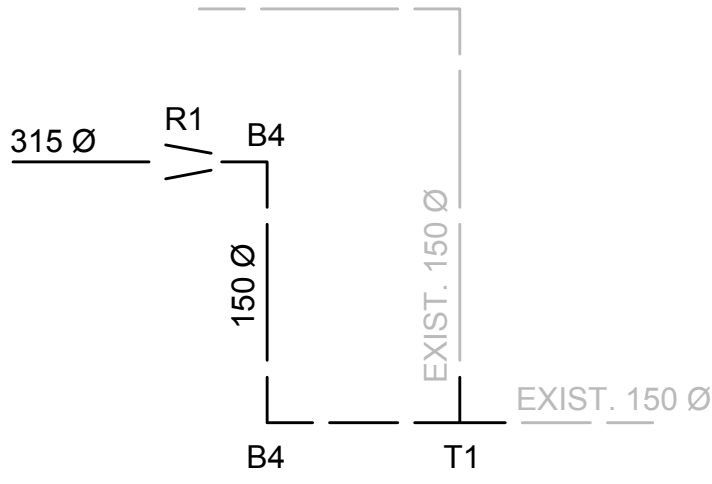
UPGRADES ON ANVIL STREET AND MAIN REEF ROAD BETWEEN ROBERT ROAD AND NADINE ROAD
